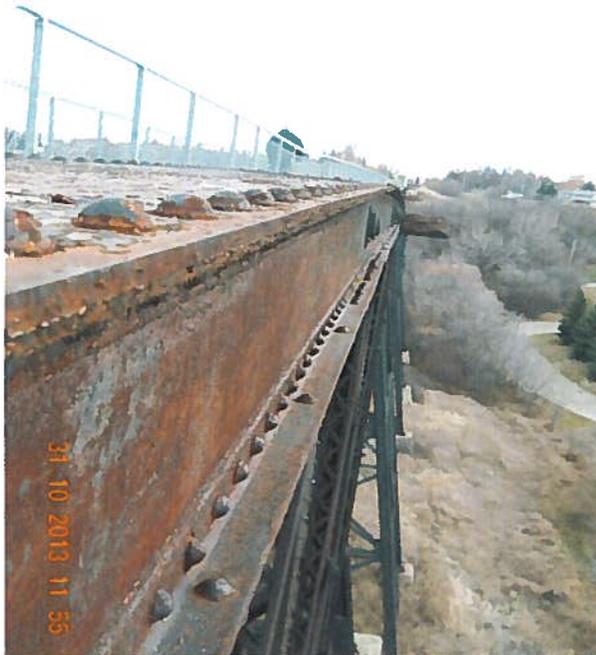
Hump in Truss T1 due to Movement of Approach Span
